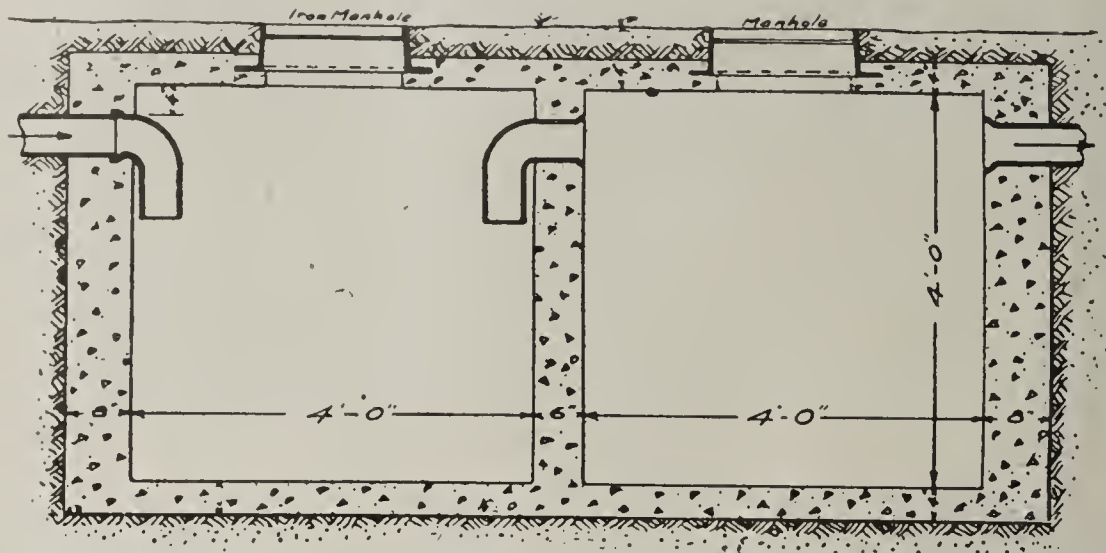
CROSS-SECTION INDICATING LOCATION OF PIPES
